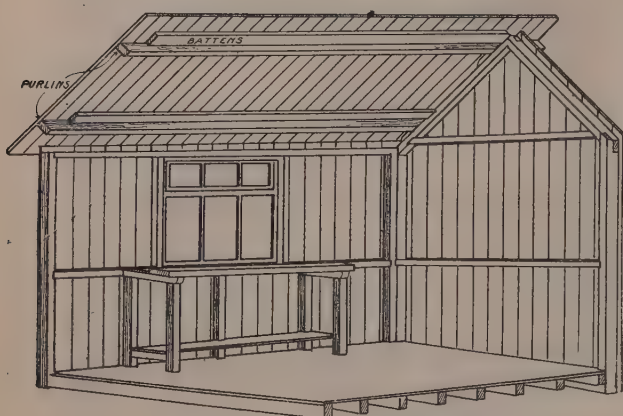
INTERIOR VIEW, SHOWING ROOF CONSTRUCTION AND BENCH ARRANGEMENT.
